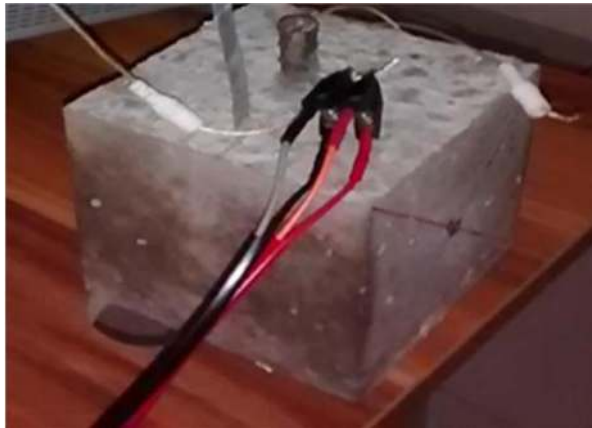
A typical concrete specimen instrumented with PZT patches in different sensor configurations.
